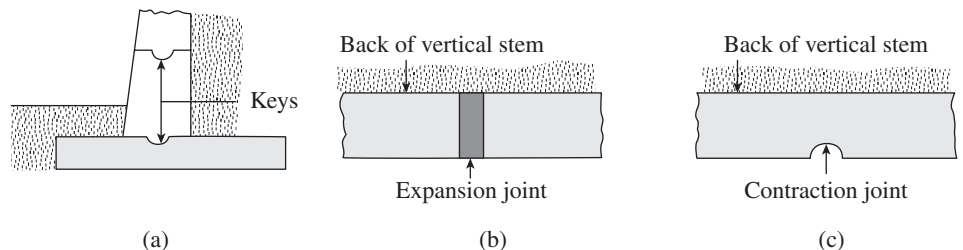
Joints in retaining walls (a) Construction (b) Expansion (c) Contraction
